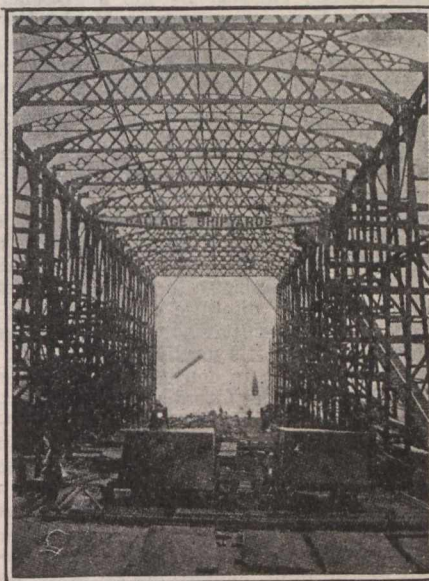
Steel shipbuilding at Wallace Shipyards, Ltd., North Vancouver.
